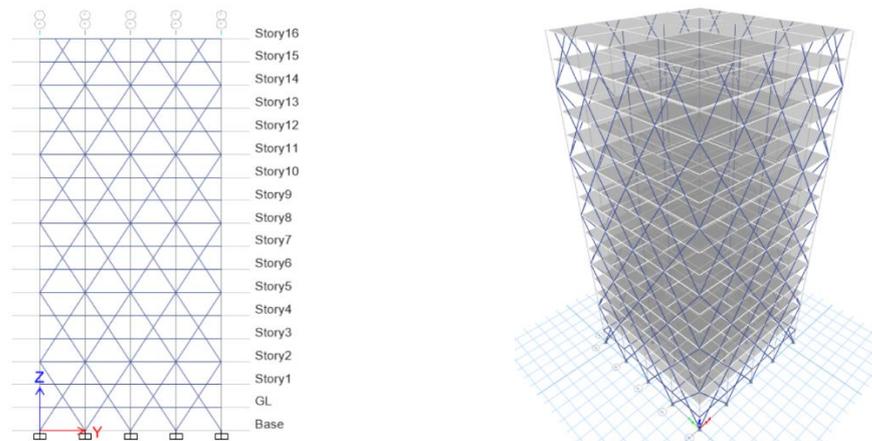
Elevation and 3D View of Bare Frame Structure Model 1
